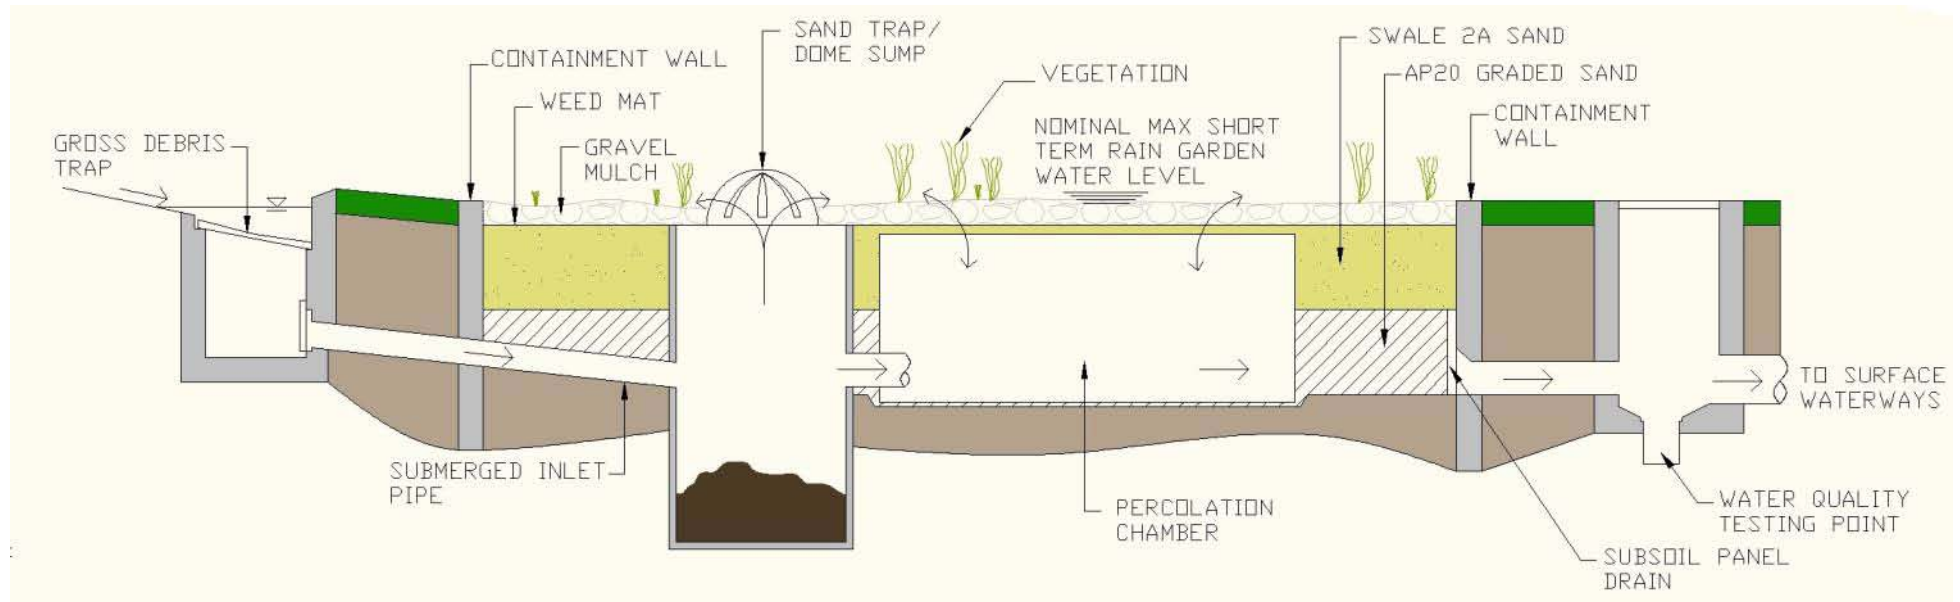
Field-scale ‘rain garden’ schematic (modified from as-built drawings provided by CCC). Stormwater flow is indicated by arrows and generally flows from left to right. The ‘gross debris trap’ and ‘sand trap’ serve as stormwater pre-treatment prior to sand filtration.
